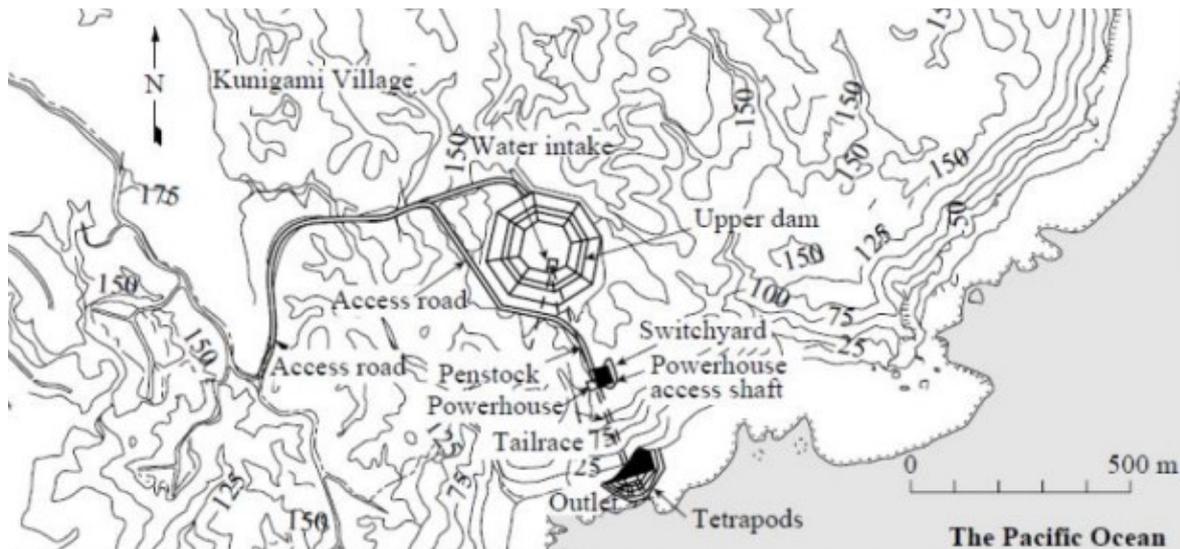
Plan view of the seawater pumped storage in Okinawa (Japan) (Fujihara 1998)
